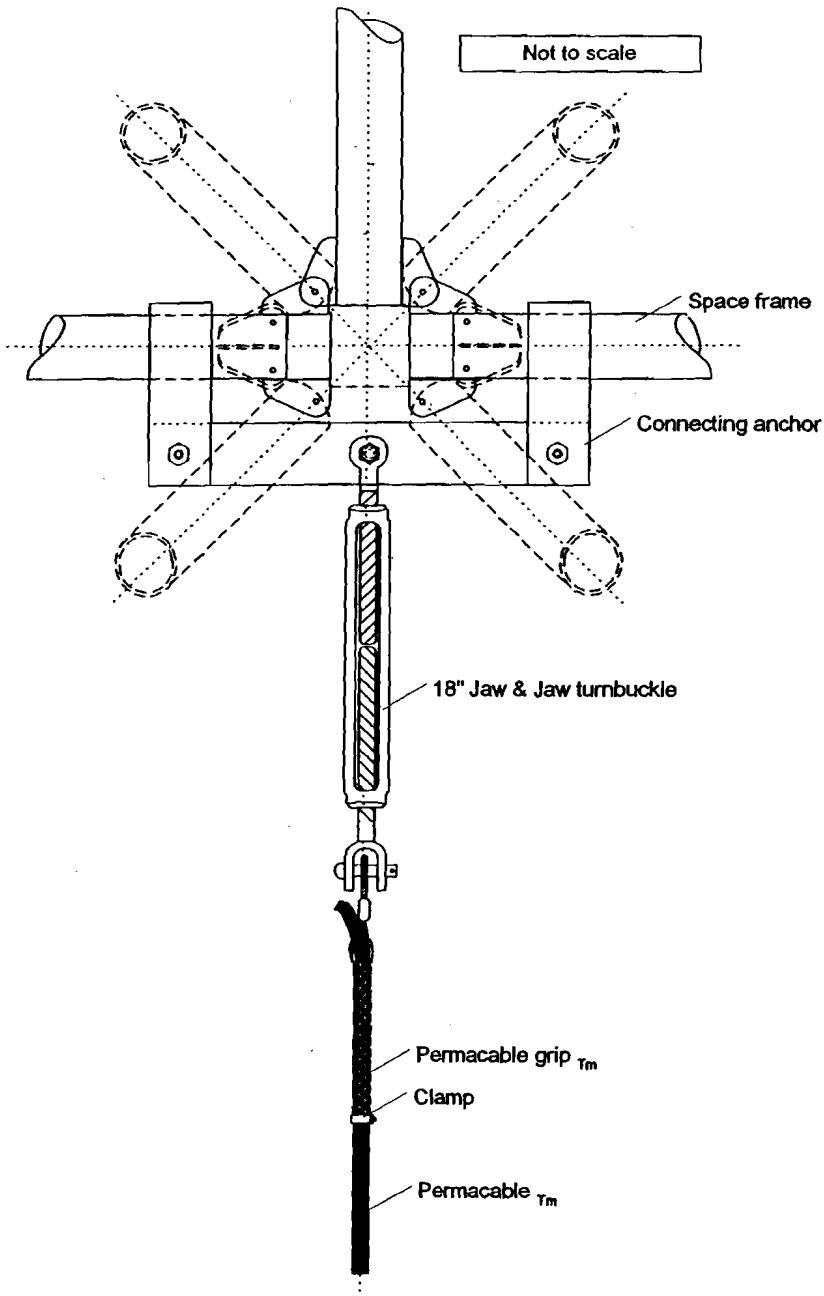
CAD drawing of the spaceframe bracket and cable attachment hardware. The assembly design allowed for placement of custom made brackets that were positioned on both sides of the space frame node centers. The brackets were interconnected with flat connector bars drilled in their centers to accept the shackle end of turnbuckles. The Permacable™ then attached to the turnbuckle, which provided final adjustment for correct tensioning across the span (approximately 2 ft static/4–5 ft dynamic at mid point). This design did not rely on welding, taking advantage of the inherent strength of materials in both the bracket assembly and the node tubes themselves.
